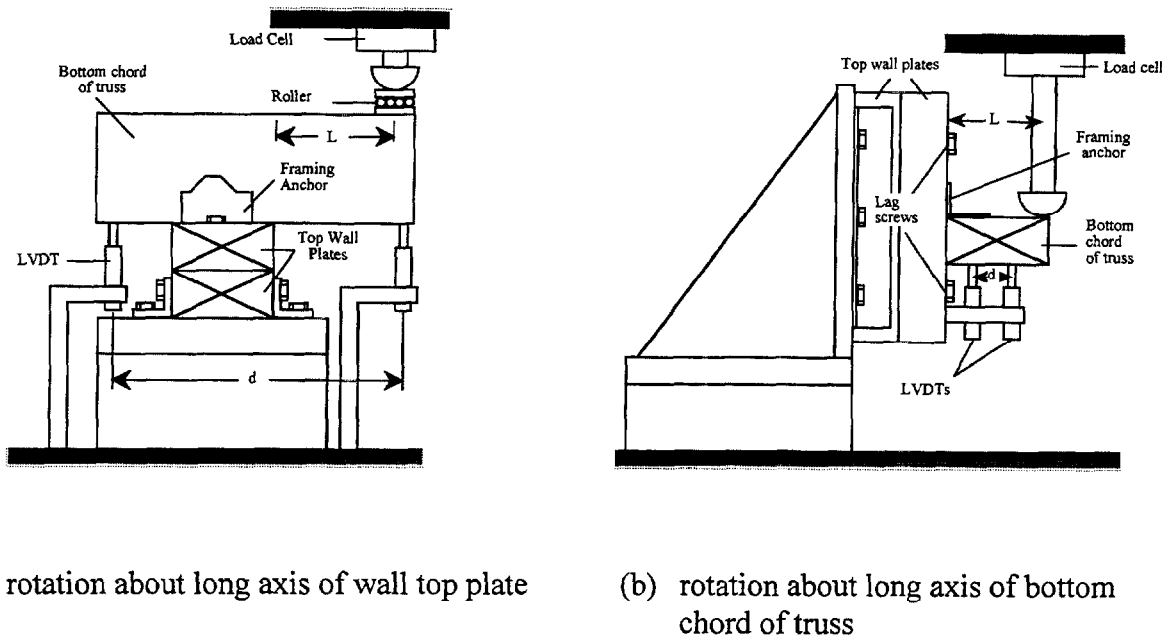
Experimental Setup for Connection between Roof and Wall (after Groom and Leichti, 1991).
